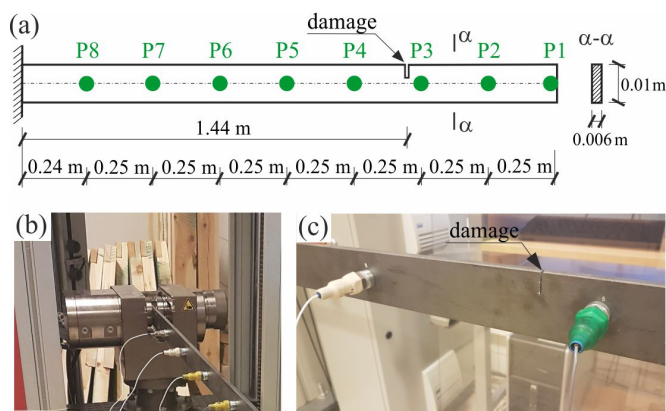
The laboratory beam: (a) the scheme with the sensors arrangement; (b) the anchor area (c) the damage area
